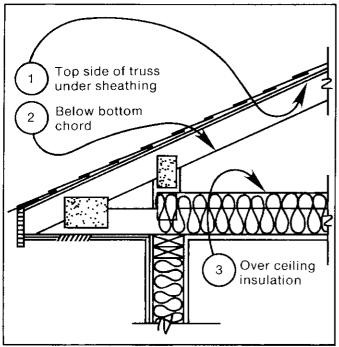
Typical Attic Section with Three Possible Locations for a Radiant Barrier
